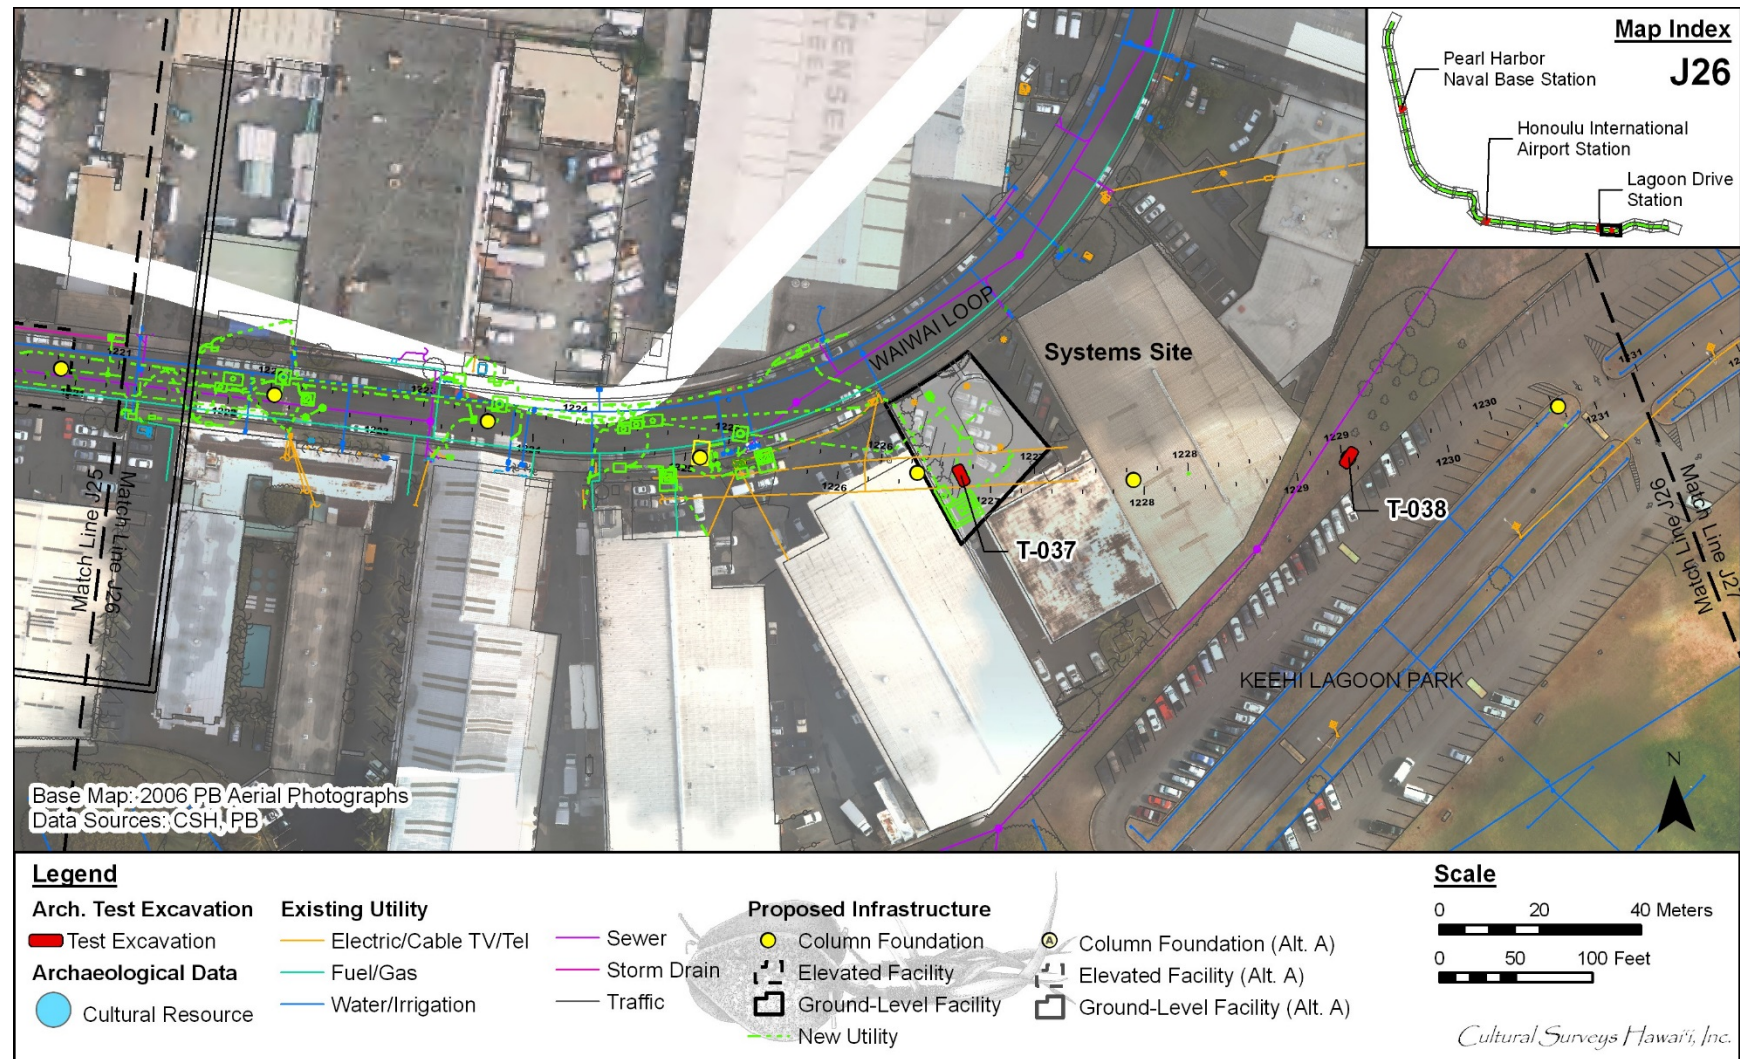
Map Sheet J26 showing the location of T-037 in the Systems Site Facility footprint southeast of Waiwai Loop and T-038 at Ke'ehi Lagoon Park
